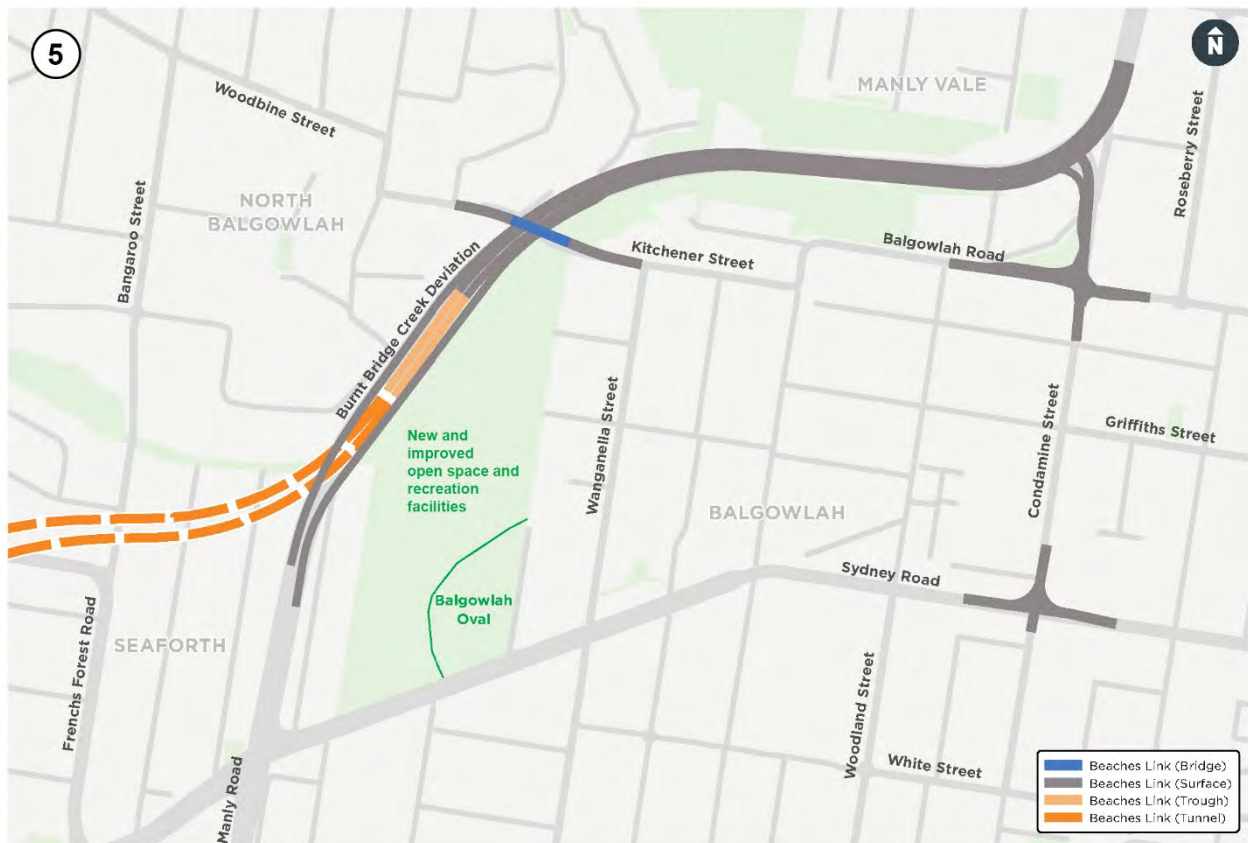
Alternative 5 - North facing tunnel ramps to Burnt Bridge Creek Deviation including Condamine Street upgrade
